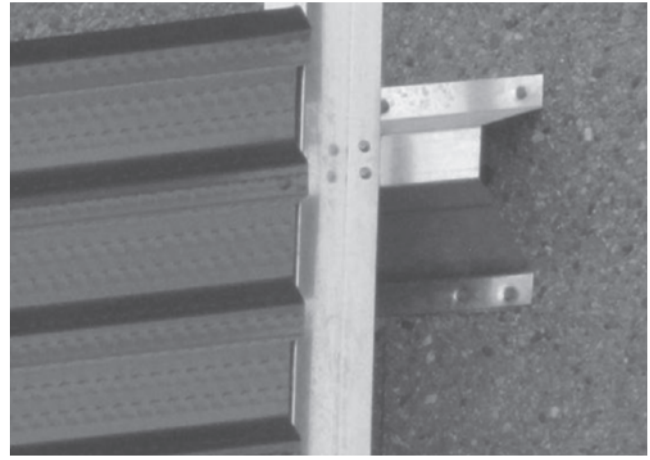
Transpired solar collector support structure attached to concrete wall. (Photo by the author).
